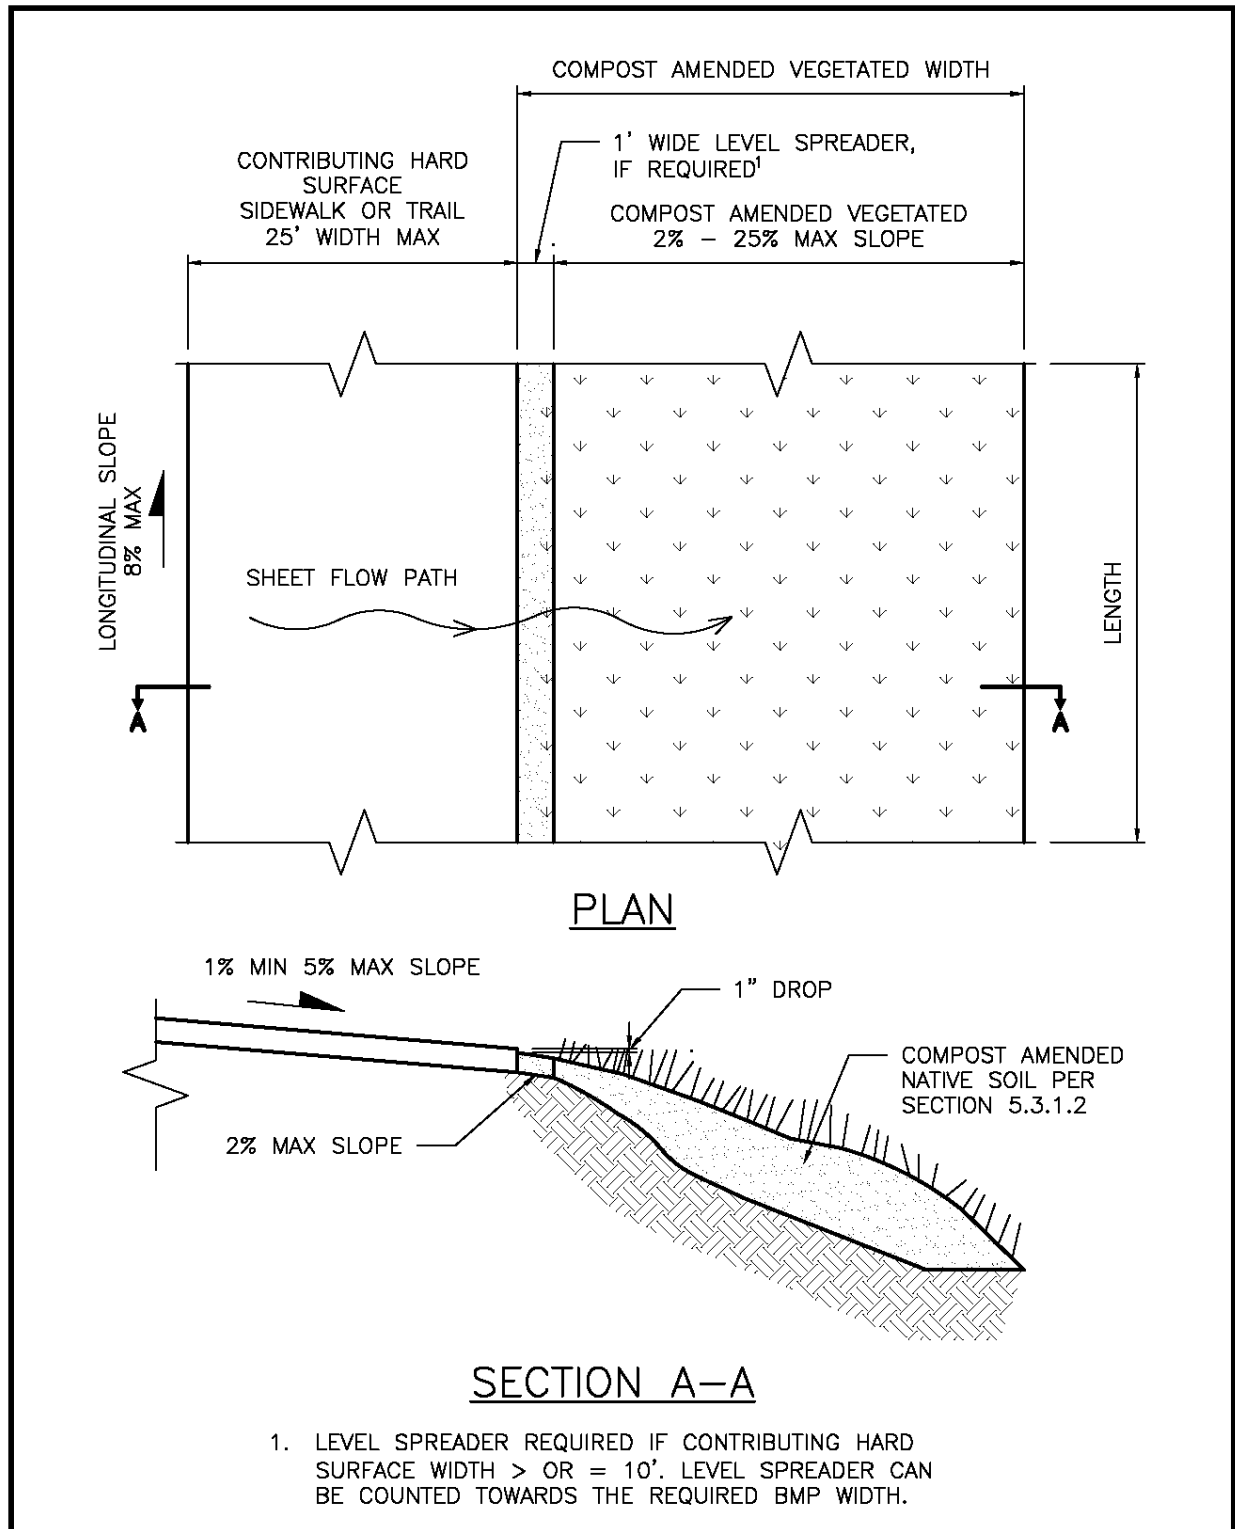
Typical Sidewalk/Trail Compost-amended Strip BMP.
